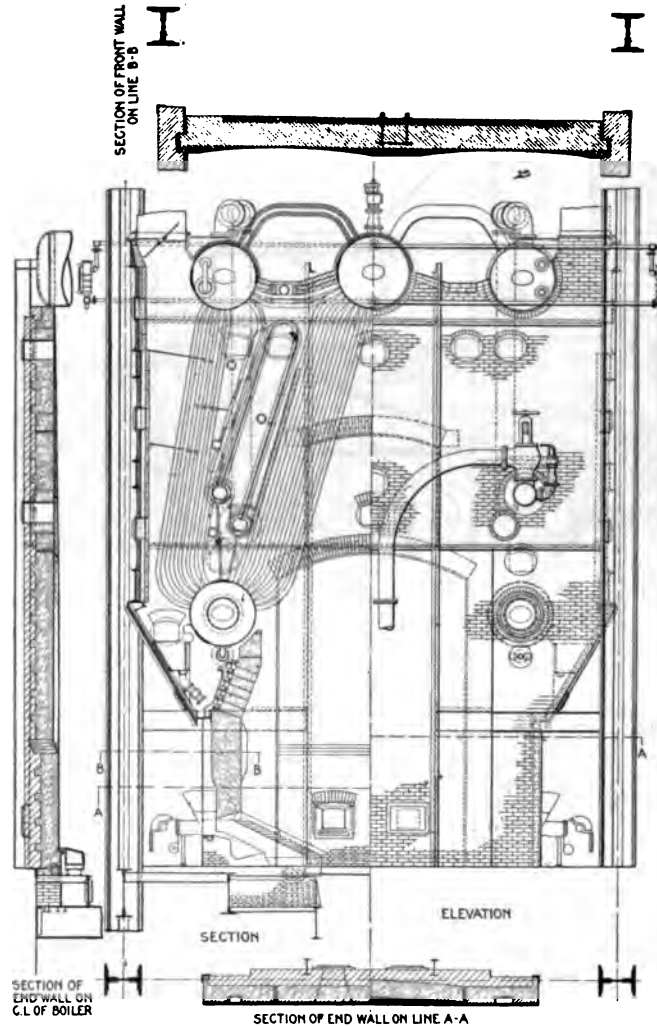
SECTION AND ELEVATION OF ONE BOILER
